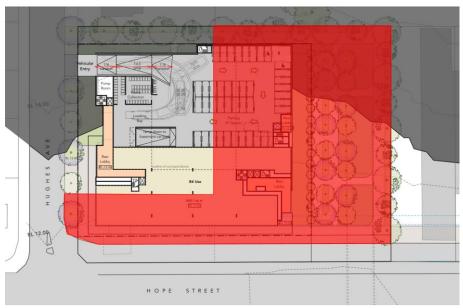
Tomola PP indicative ground floor plan and proposed land acquisition (shaded red) (Source: Olsson Architects)
